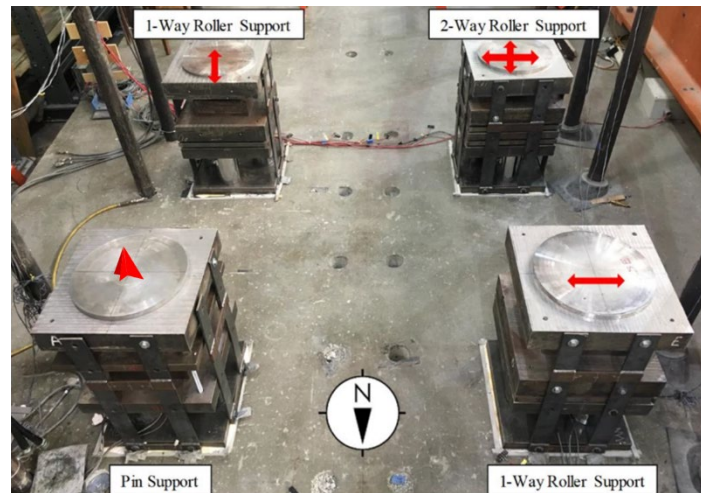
Layout of the supporting system (Yi et al., 2022)
